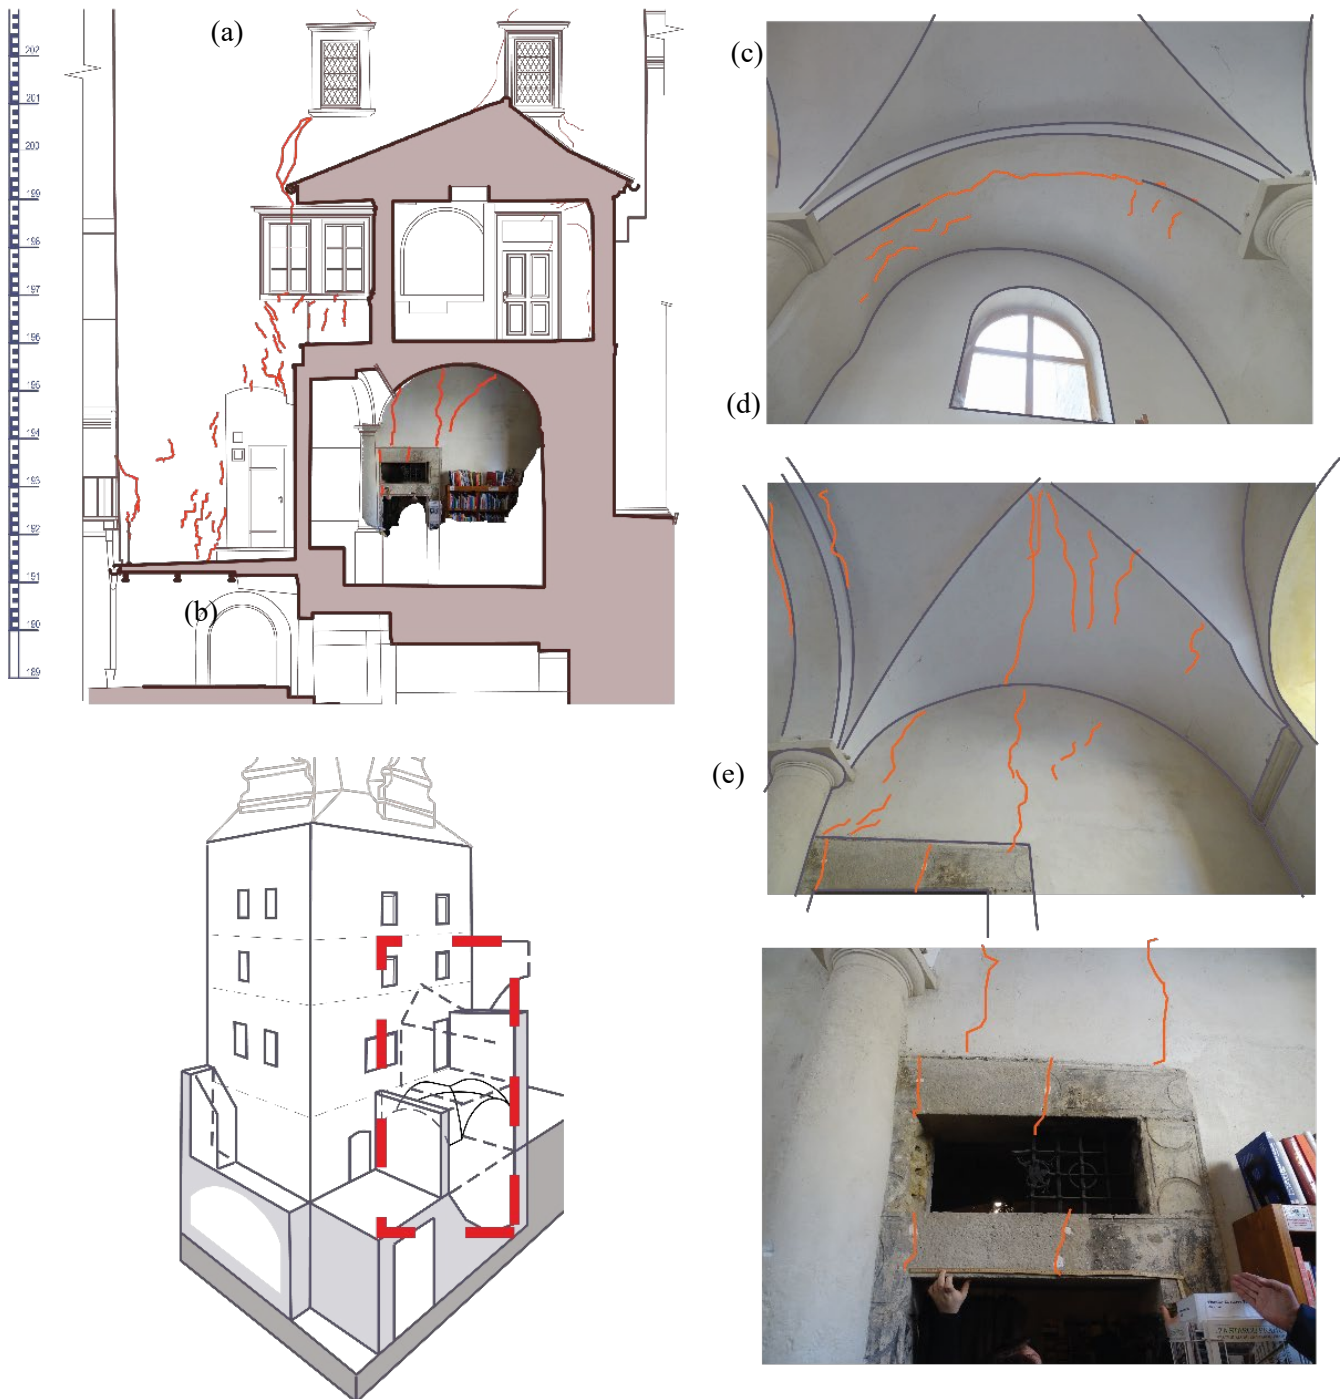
Crack mapping – the interior of the intersection between the tower and structure of the house 56.
